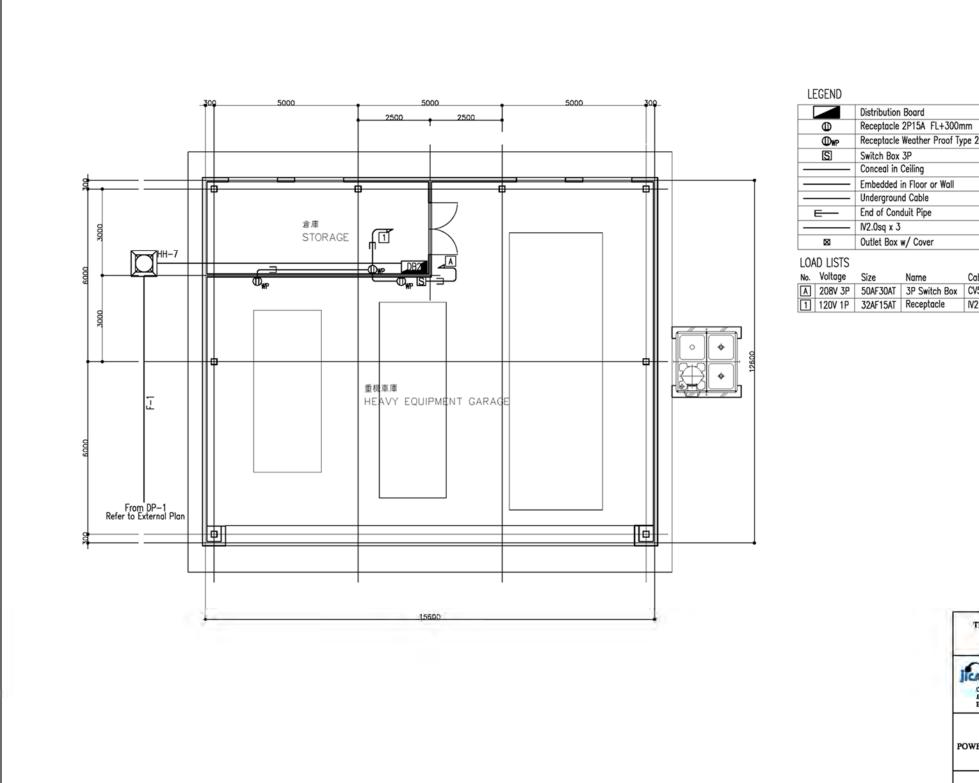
Mechanical Facilities in Heavy Equipment Garage Power and Receptacle Wiring Plan
